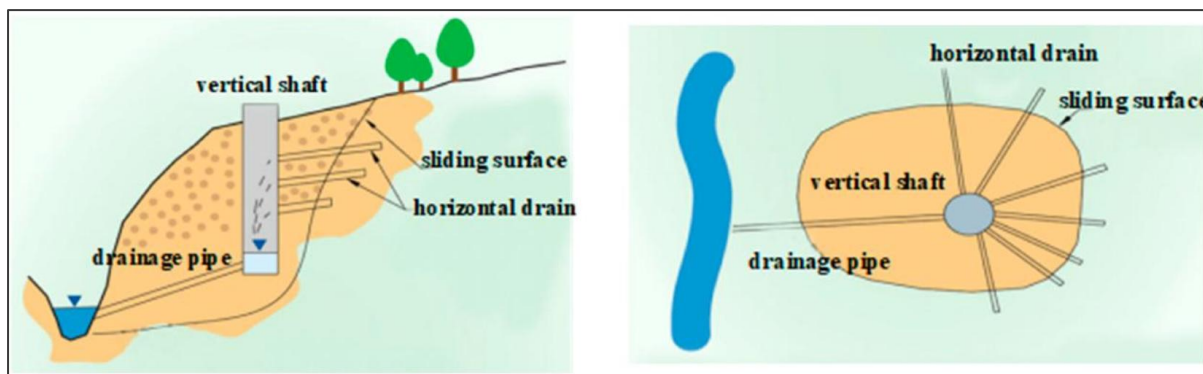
Schematic Detail of the proposed capturing system (GCS, 2025)
